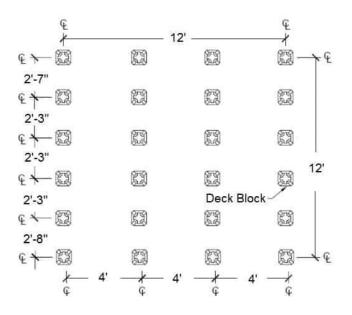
Sketch showing an example of block plan with proper distancing ²⁷⁹
